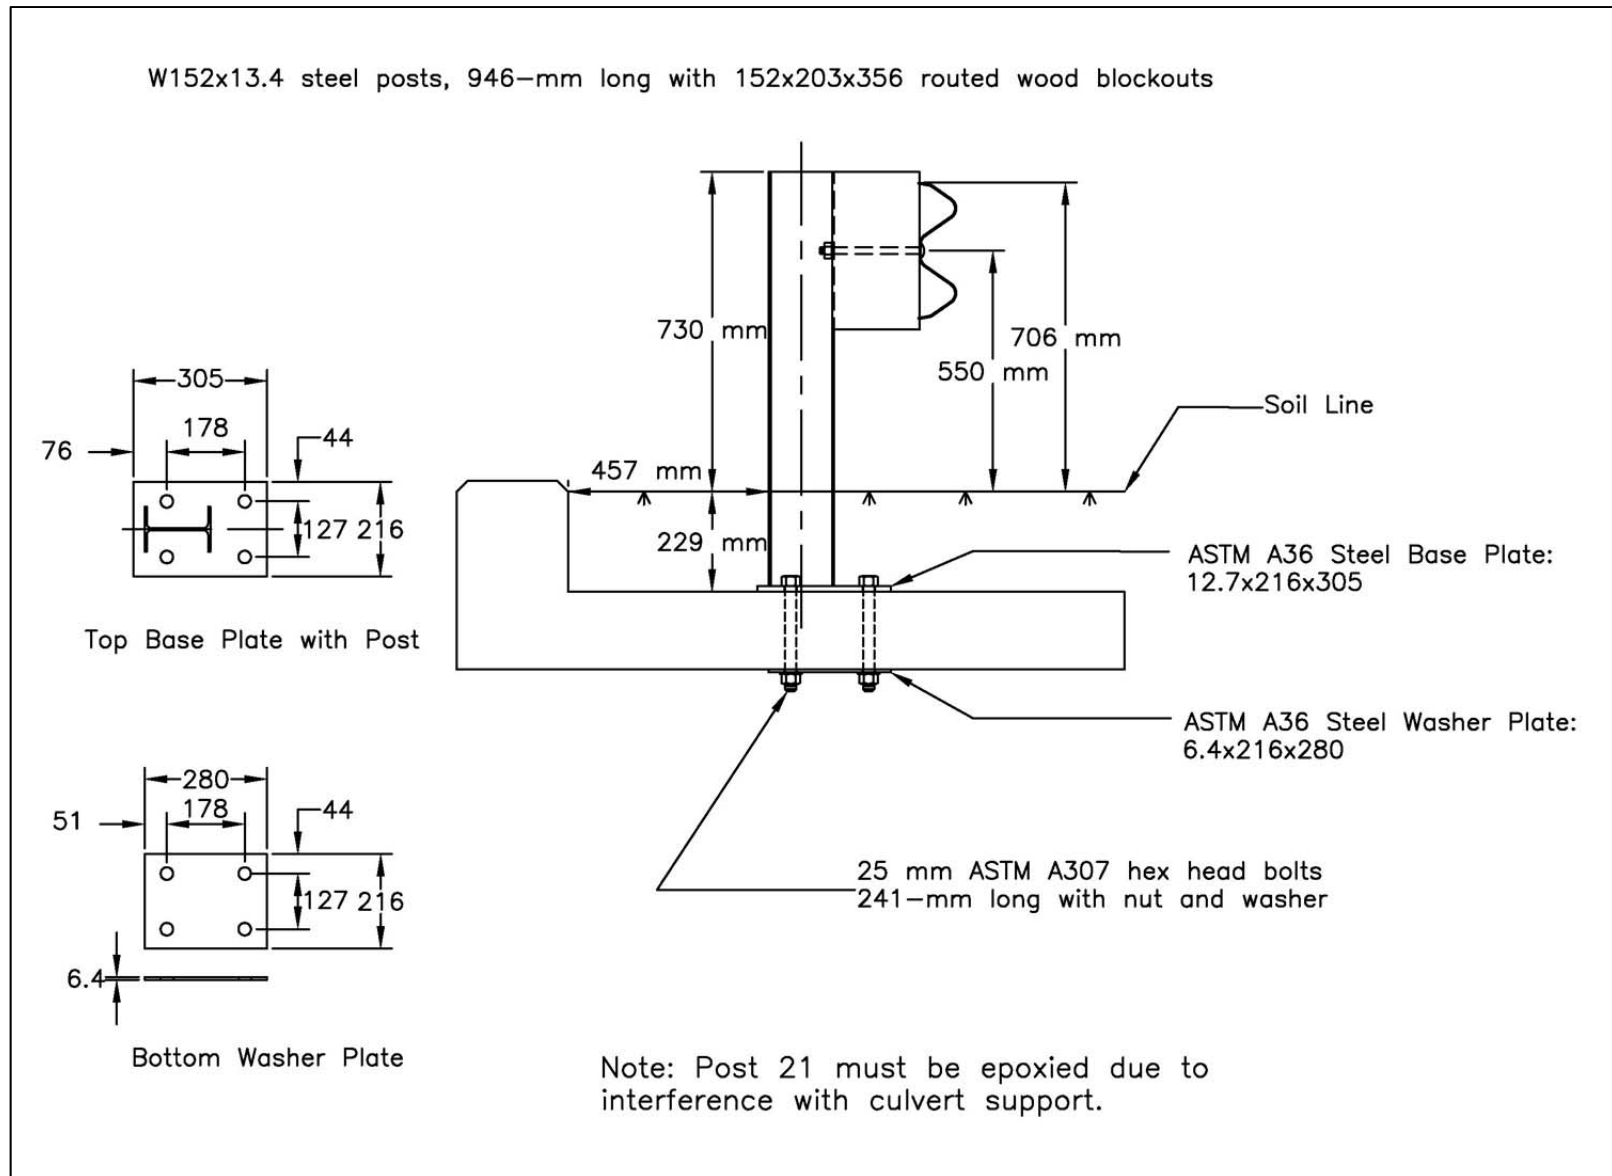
Original System Details for Guardrail Attachment to Culverts [1]
